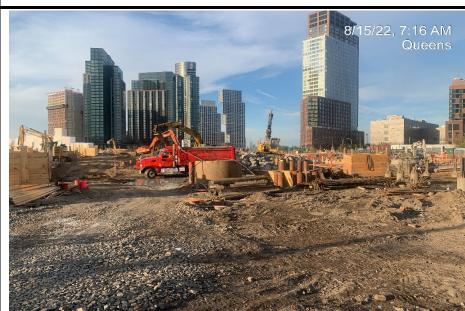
Civetta doing rebar work in WC-10. View facing northwest.
